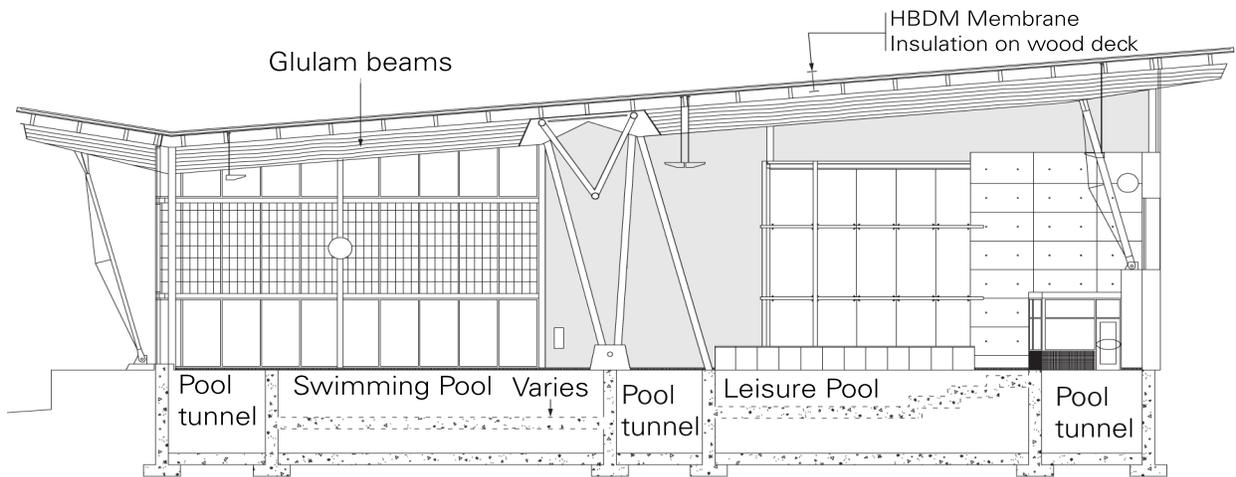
Section through swimming pool showing sustainable wood roof construction (www.cwc.ca, 2009)
